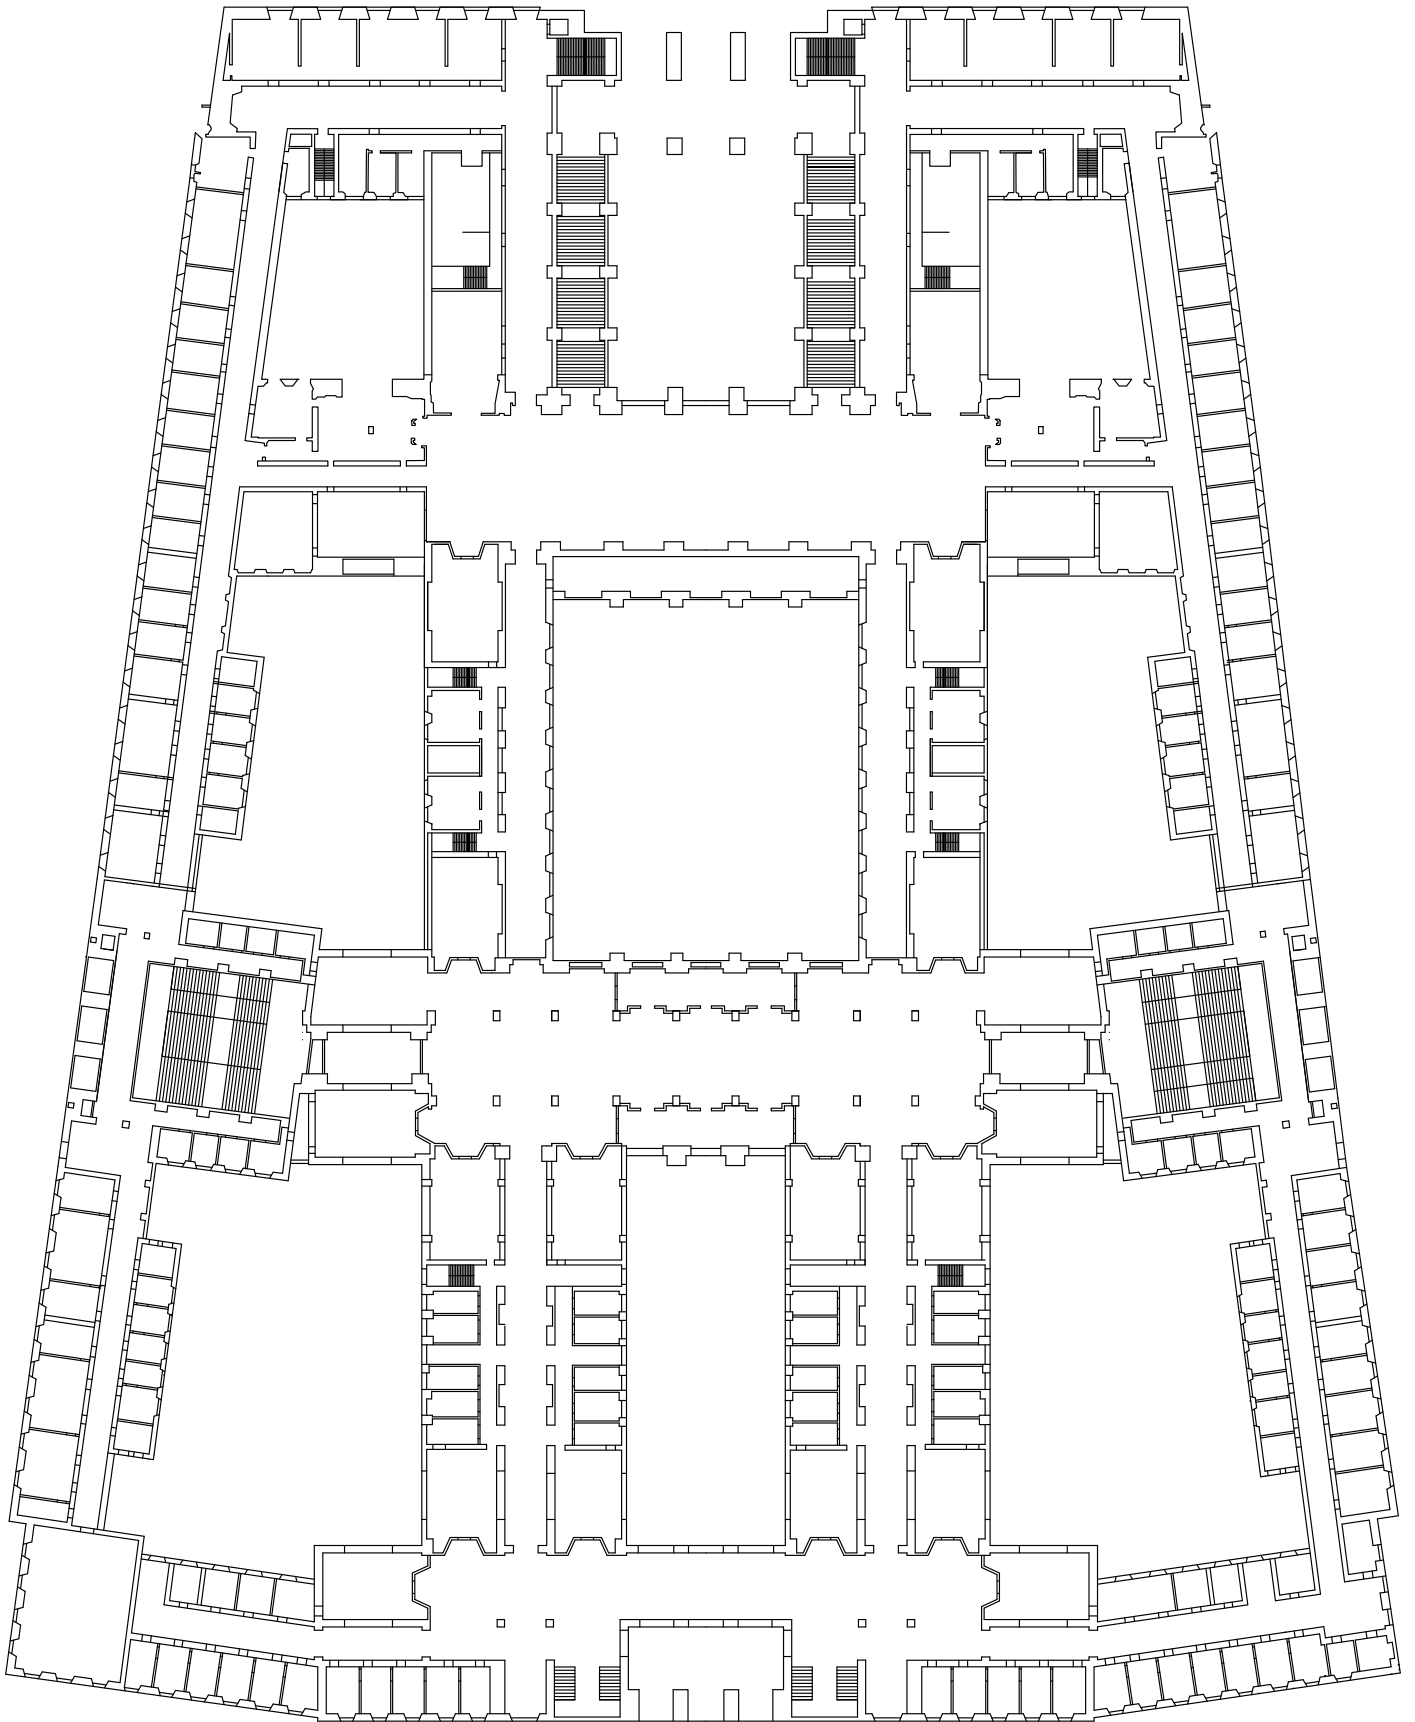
Noble First Floor Plan, 14.10 m above sea level.
